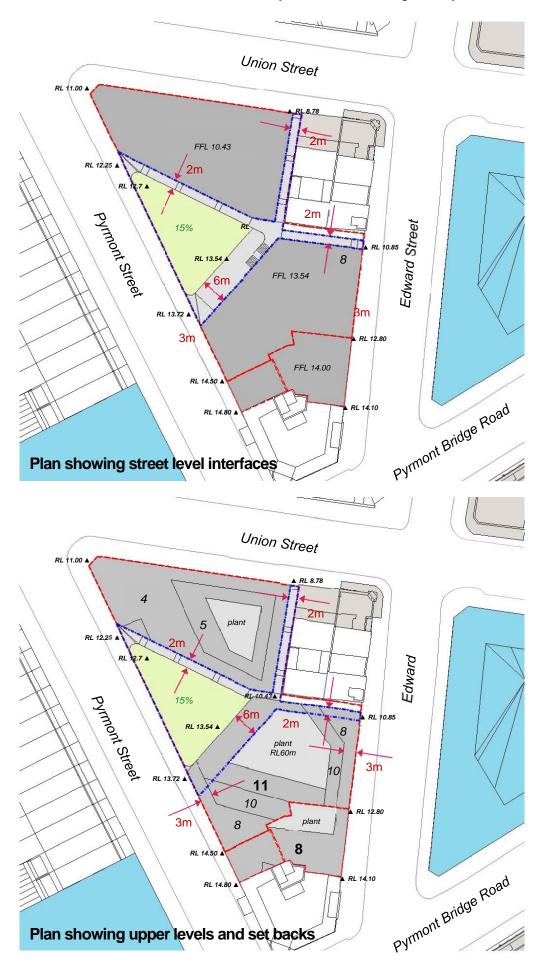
proposed site plan for 13A-29 Union Street & 69-72 Edward Street
